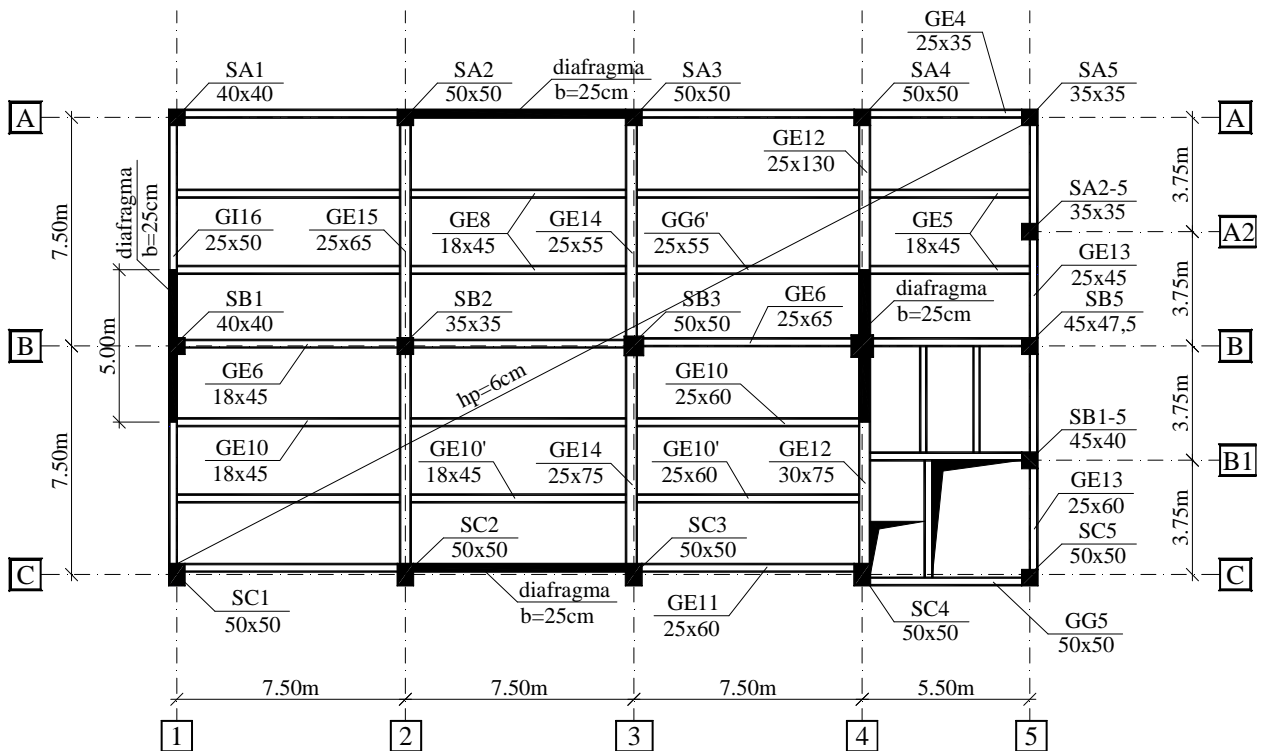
PROPOSED STRUCTURE: Framing plan level +18,40 m
